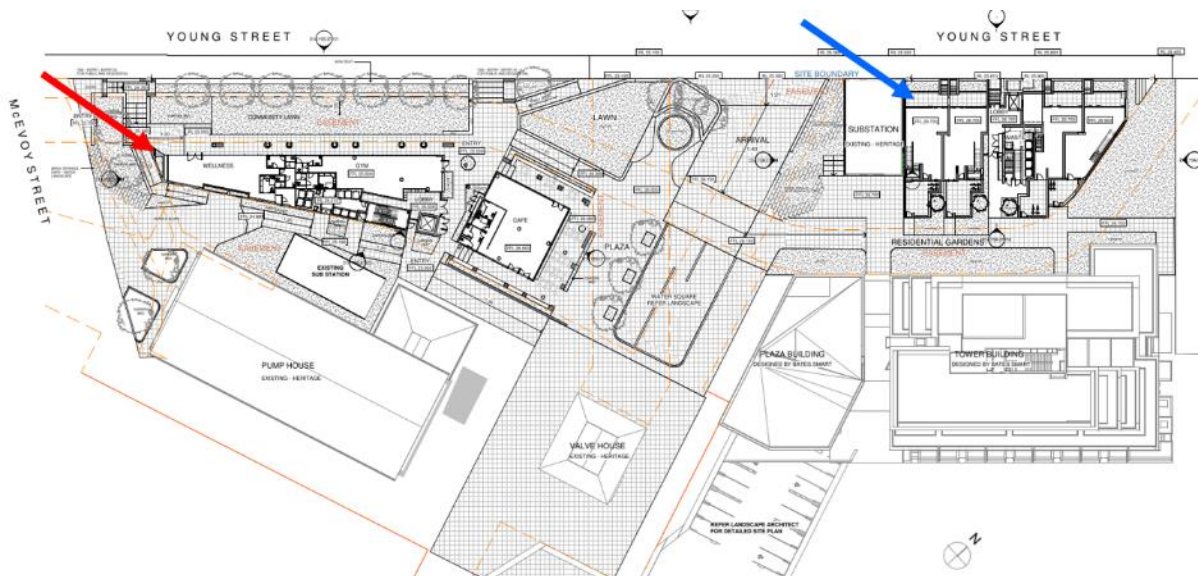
Ground level plan: Young Street North (blue arrow) and Young Street South (red arrow)
